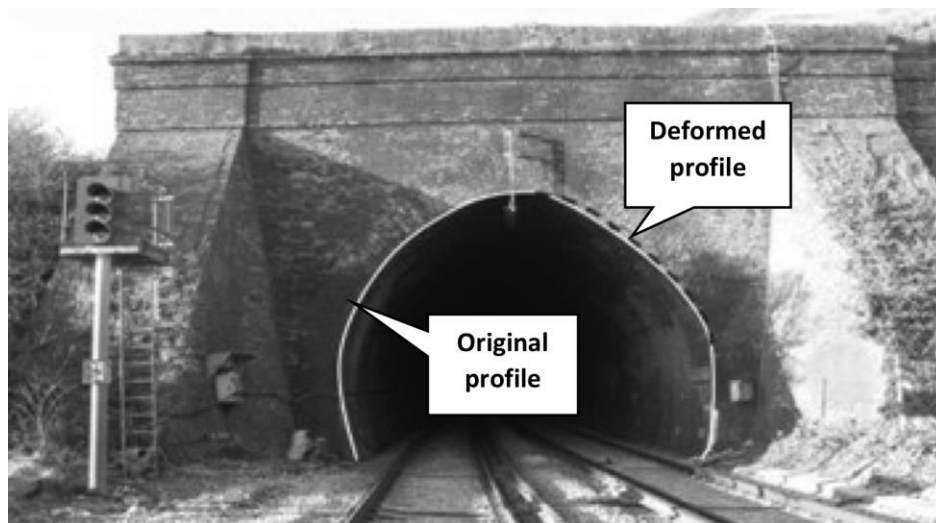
A typical tunnel deformation due to ground stress [36].
